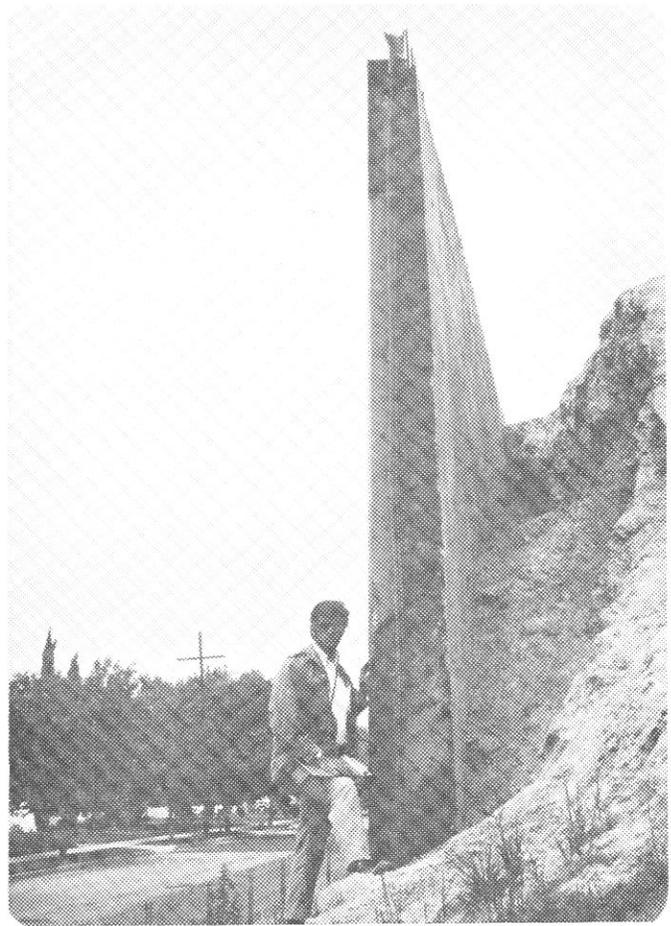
Completed retaining wall on Route 118 showed no evidence of damage.
